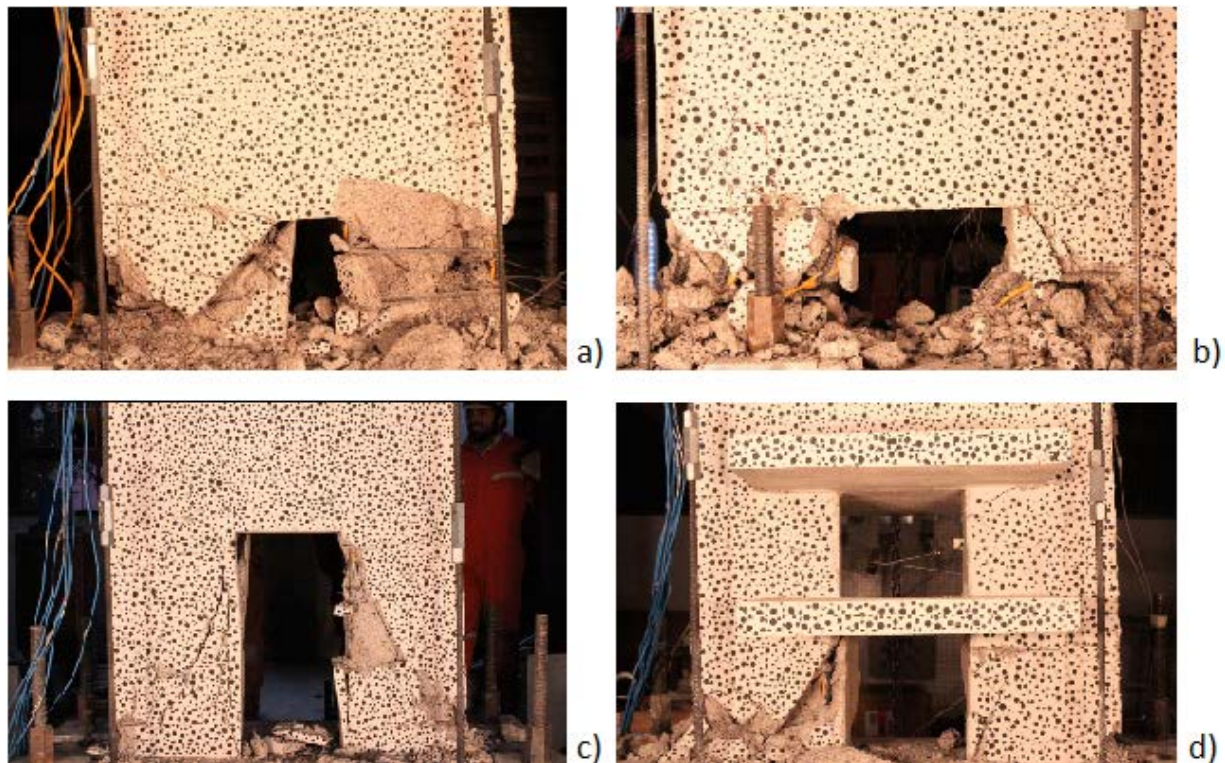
Damage at wall base for specimens: (a) MR1, (b) MR2, (c) MR3 and (d) MR4.
